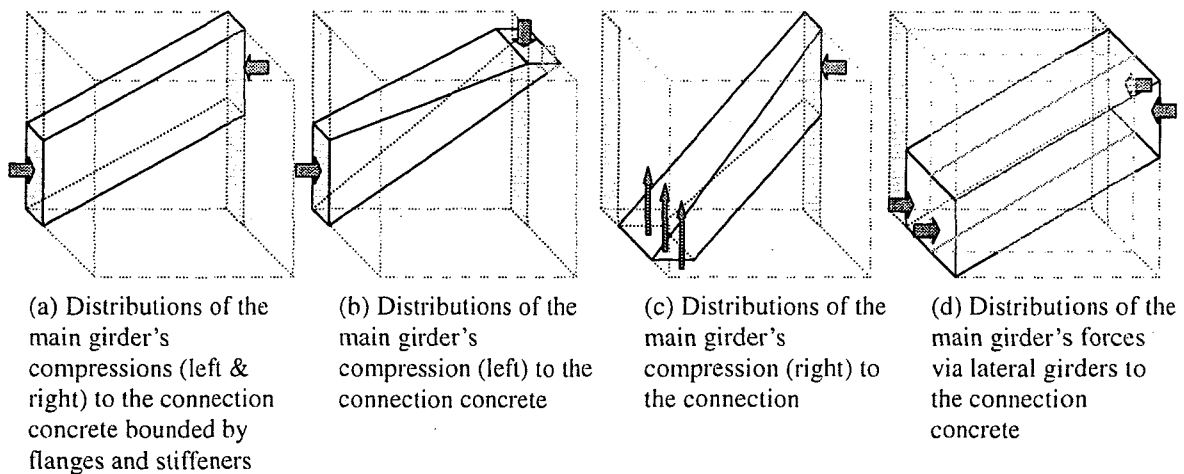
Force transfer mechanisms inside connection concrete of specimen C-3.
